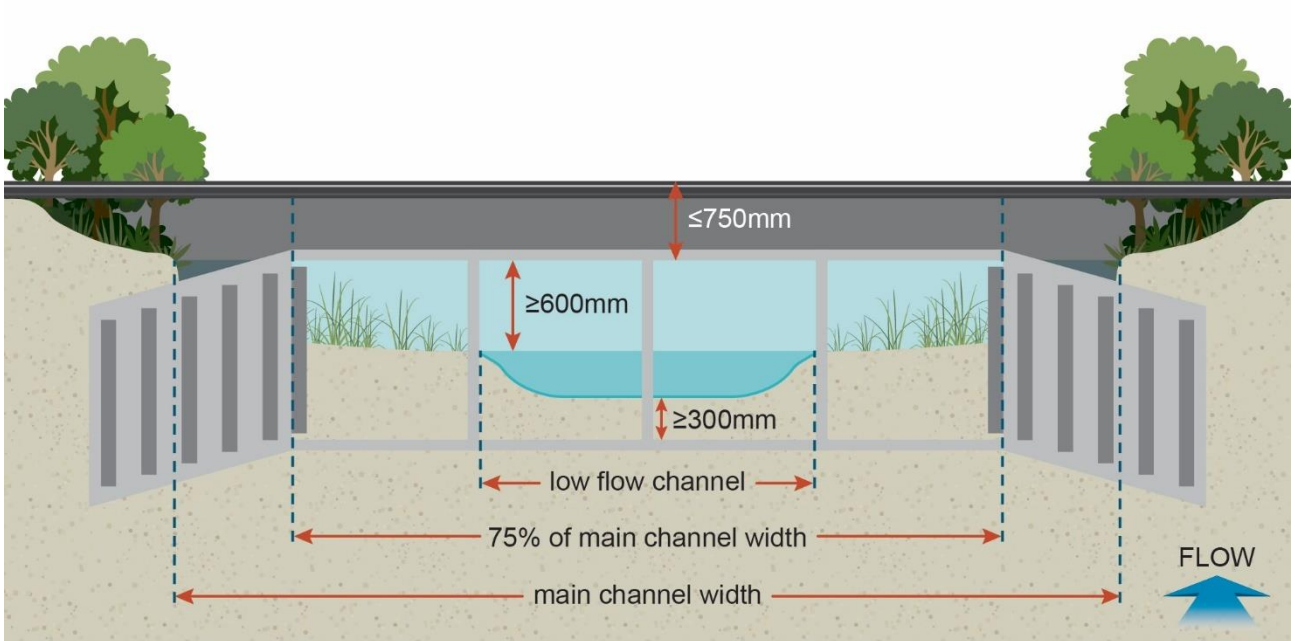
Culvert crossing option 1 (cross-section of waterway) – red waterway
